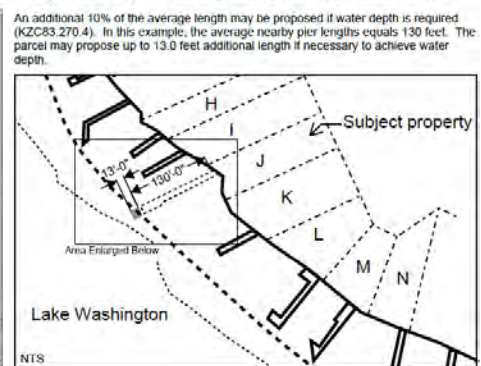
B - How to determine the maximum length a pier may extend beyond existing nearby piers (KZC 83.270.4).
